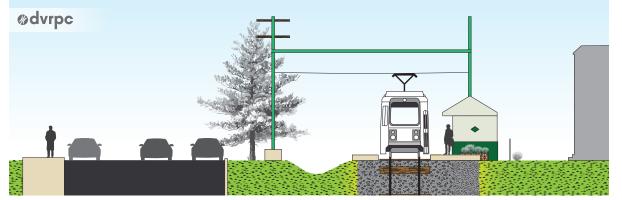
| Single track in exclusive right-of-way, typical cross-section
